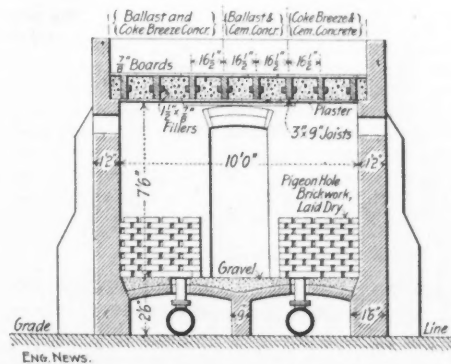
Section of Testing House Showing Wooden Joist and Concrete Floor.
